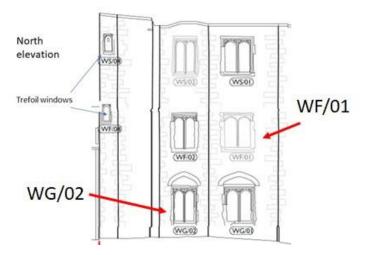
The North elevation of the Tower showing windows WG/02 and WF/01
